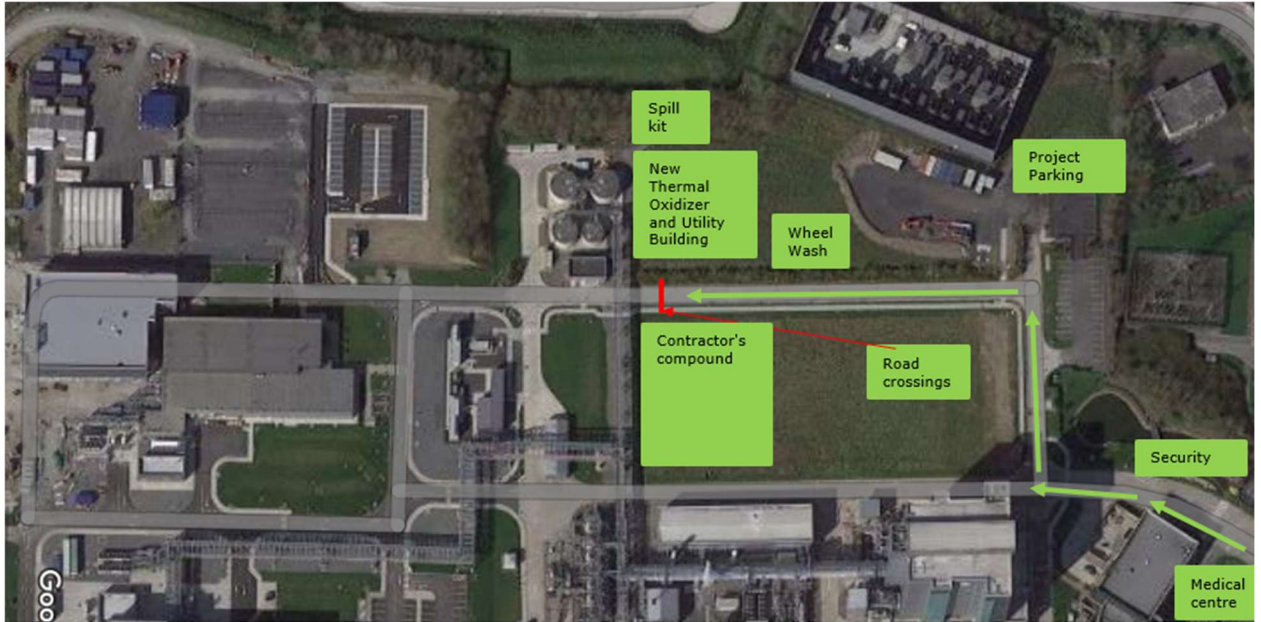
Site Plan Highlighting Thermal Oxidiser & Utility Building Location
